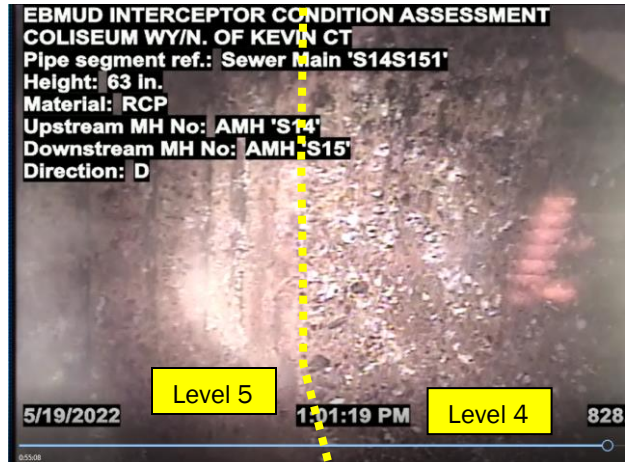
Approx. transition point between VANDA Level 4 to Level 5 at 12 feet upstream of S15
